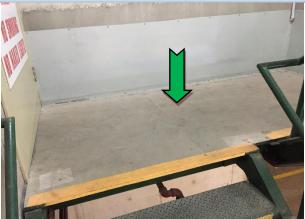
Interior: level 13, landing adjacent diesel motor room, floor – non-asbestos containing compressed cement sheeting.
